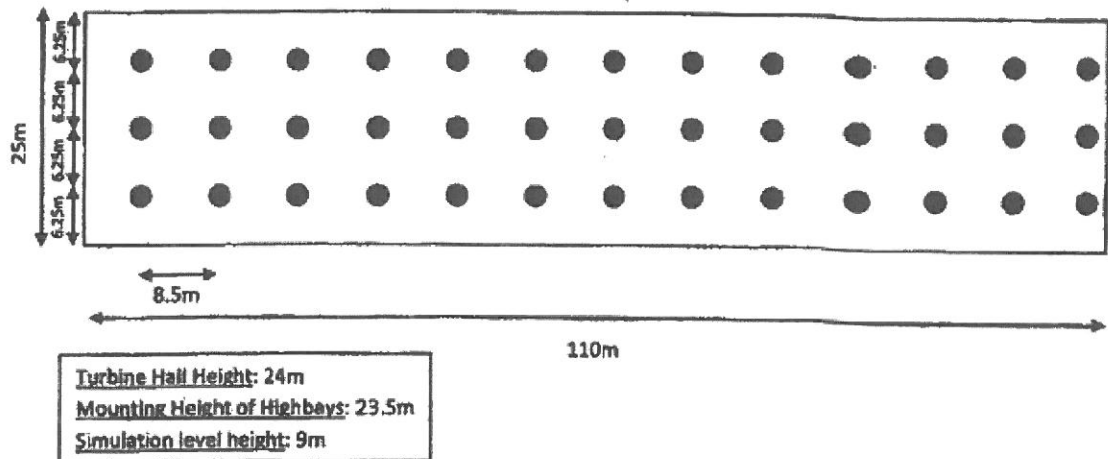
Schematic Diagram of Medupl Unit 6 Turbine Hall – Plan Layout (N.T.S)
